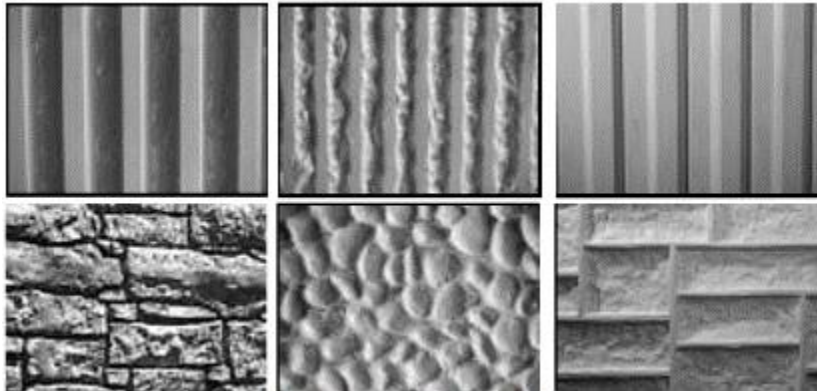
Textured Formwork for wall finishes (Dayton Superior)
